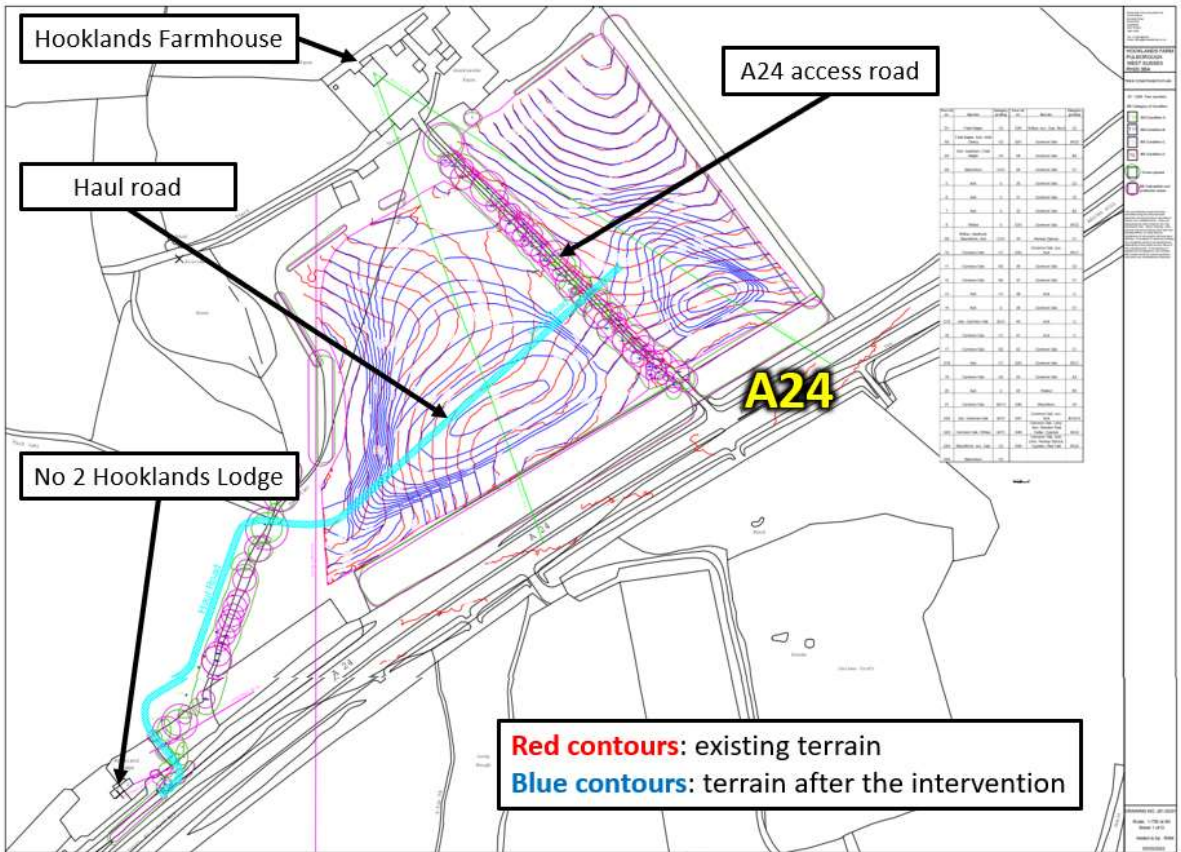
Existing and Proposed Site Layout (with temporary haul road)
